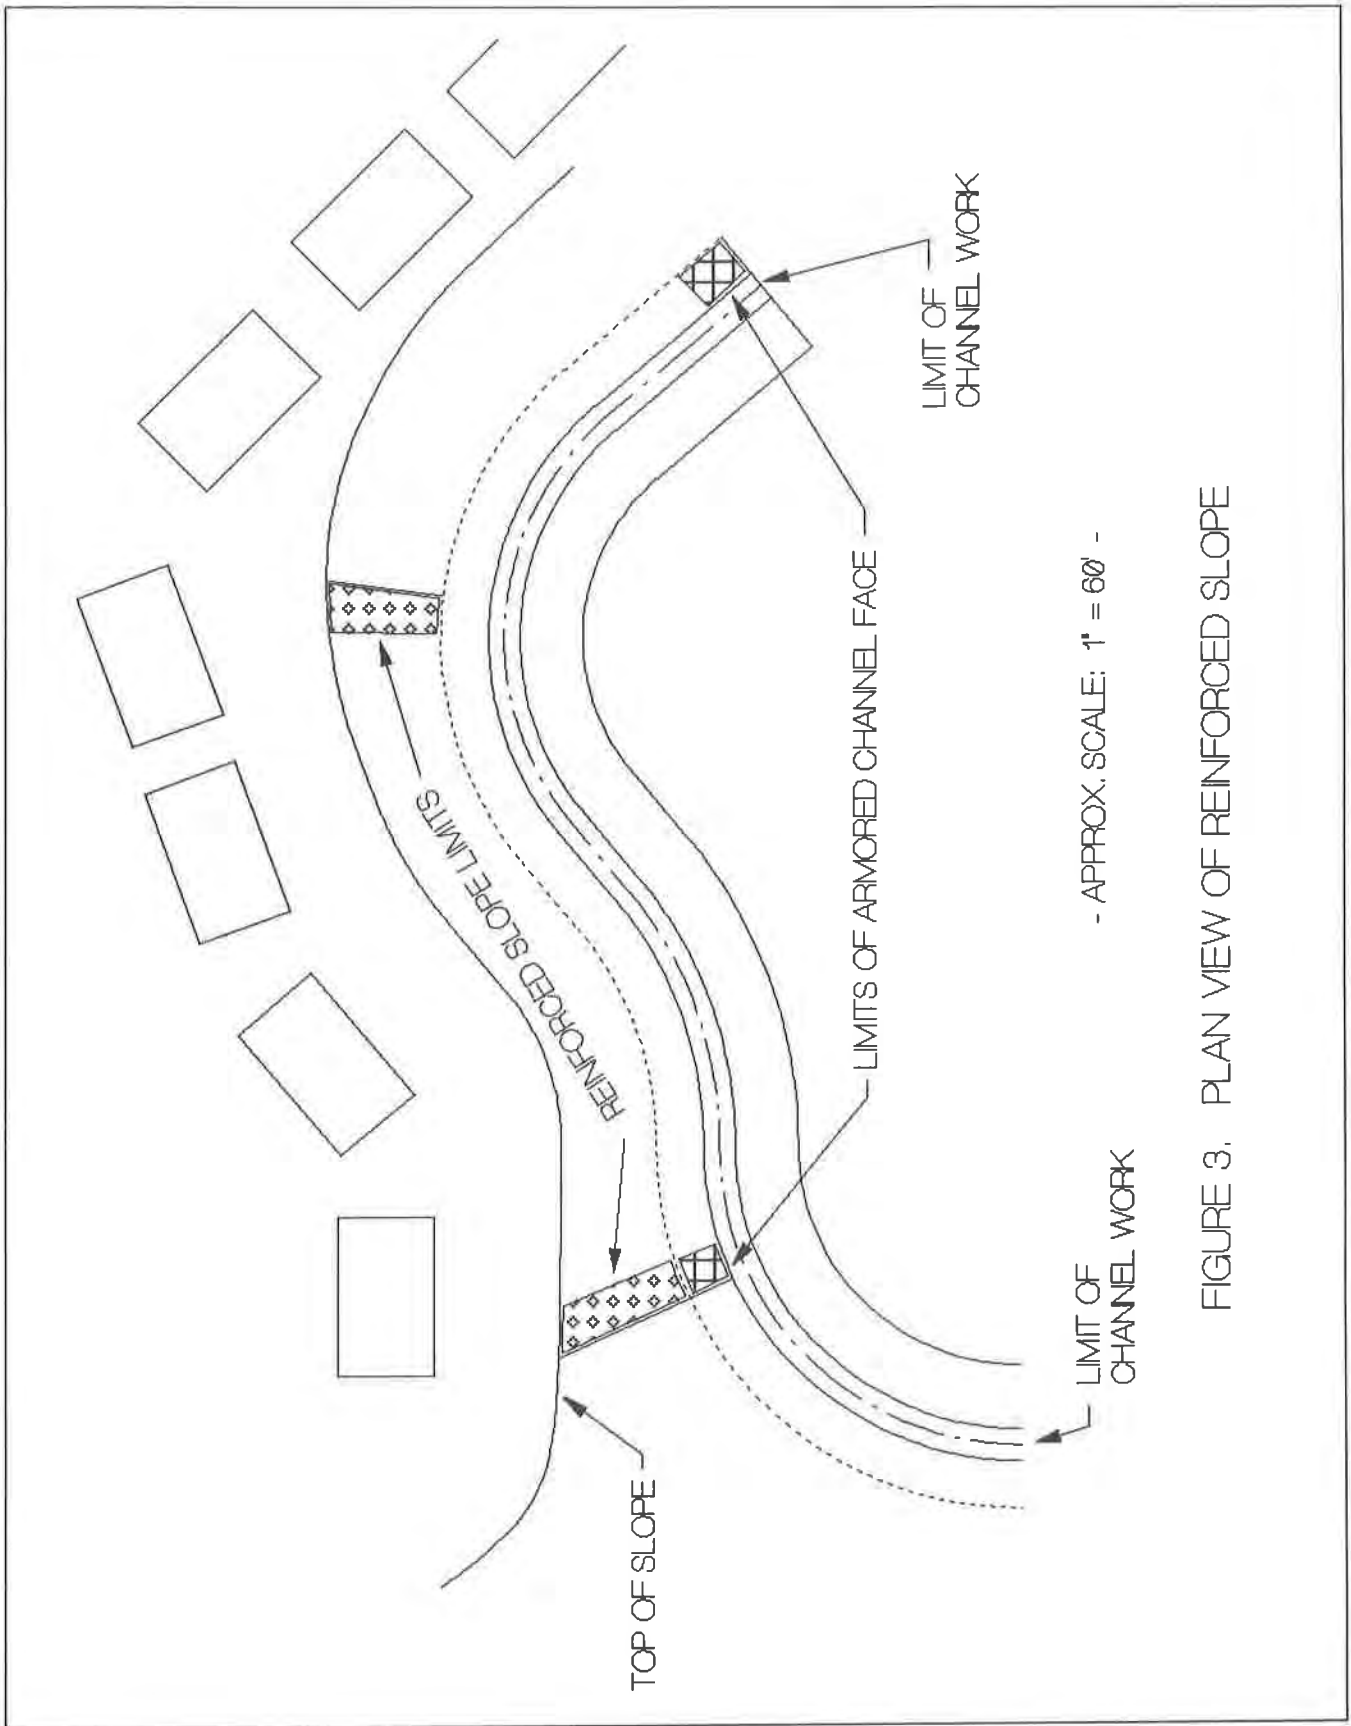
PLAN VIEW OF REINFORCED SLOPE
